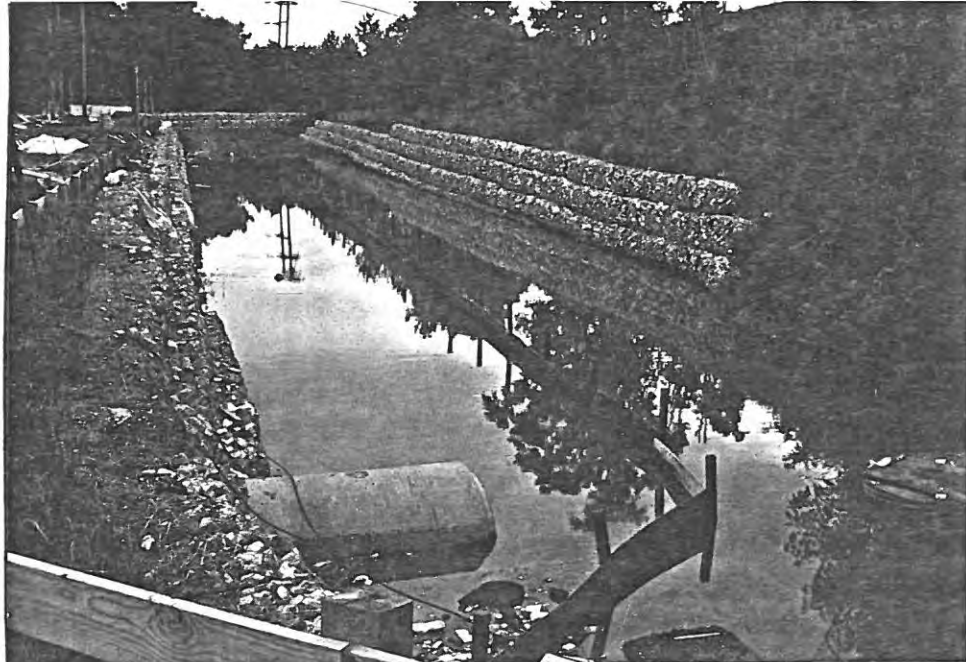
Stormwater Management Facility Southeast of Annapolis Mall
